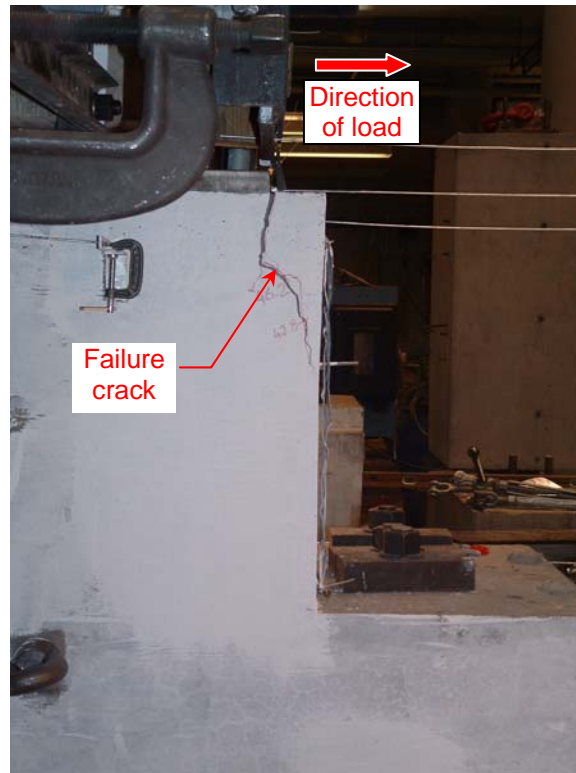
Location of failure crack on North side of bottom concrete block.
